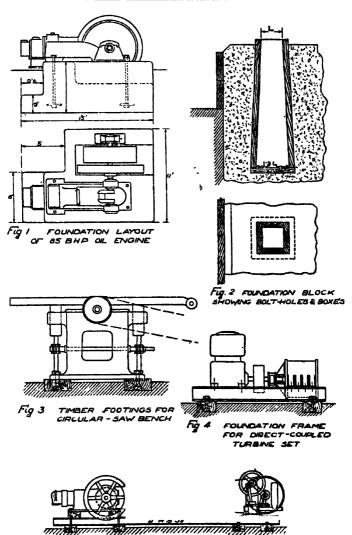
FOUNDATION FRAME FOR BELT-DRIVEN PUMP
